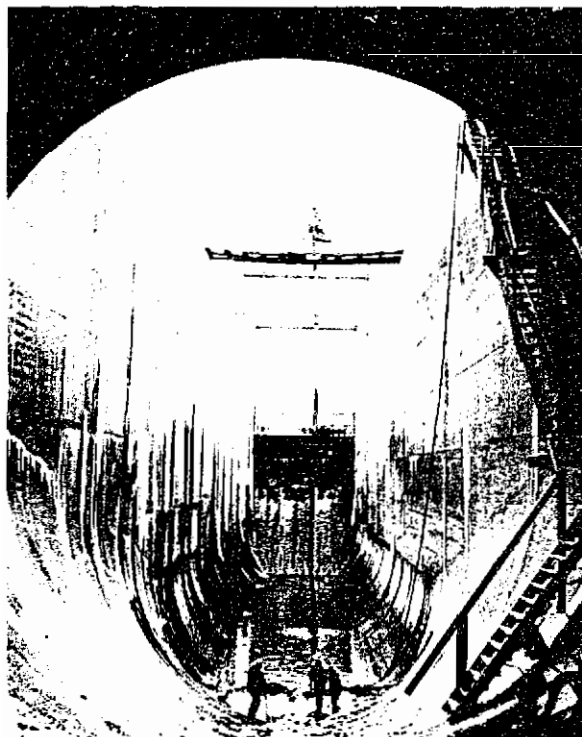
View of spillway tunnel stilling basin showing access to downstream spillway tunnel portal by stairway. Photo P459-640-4429 NA
